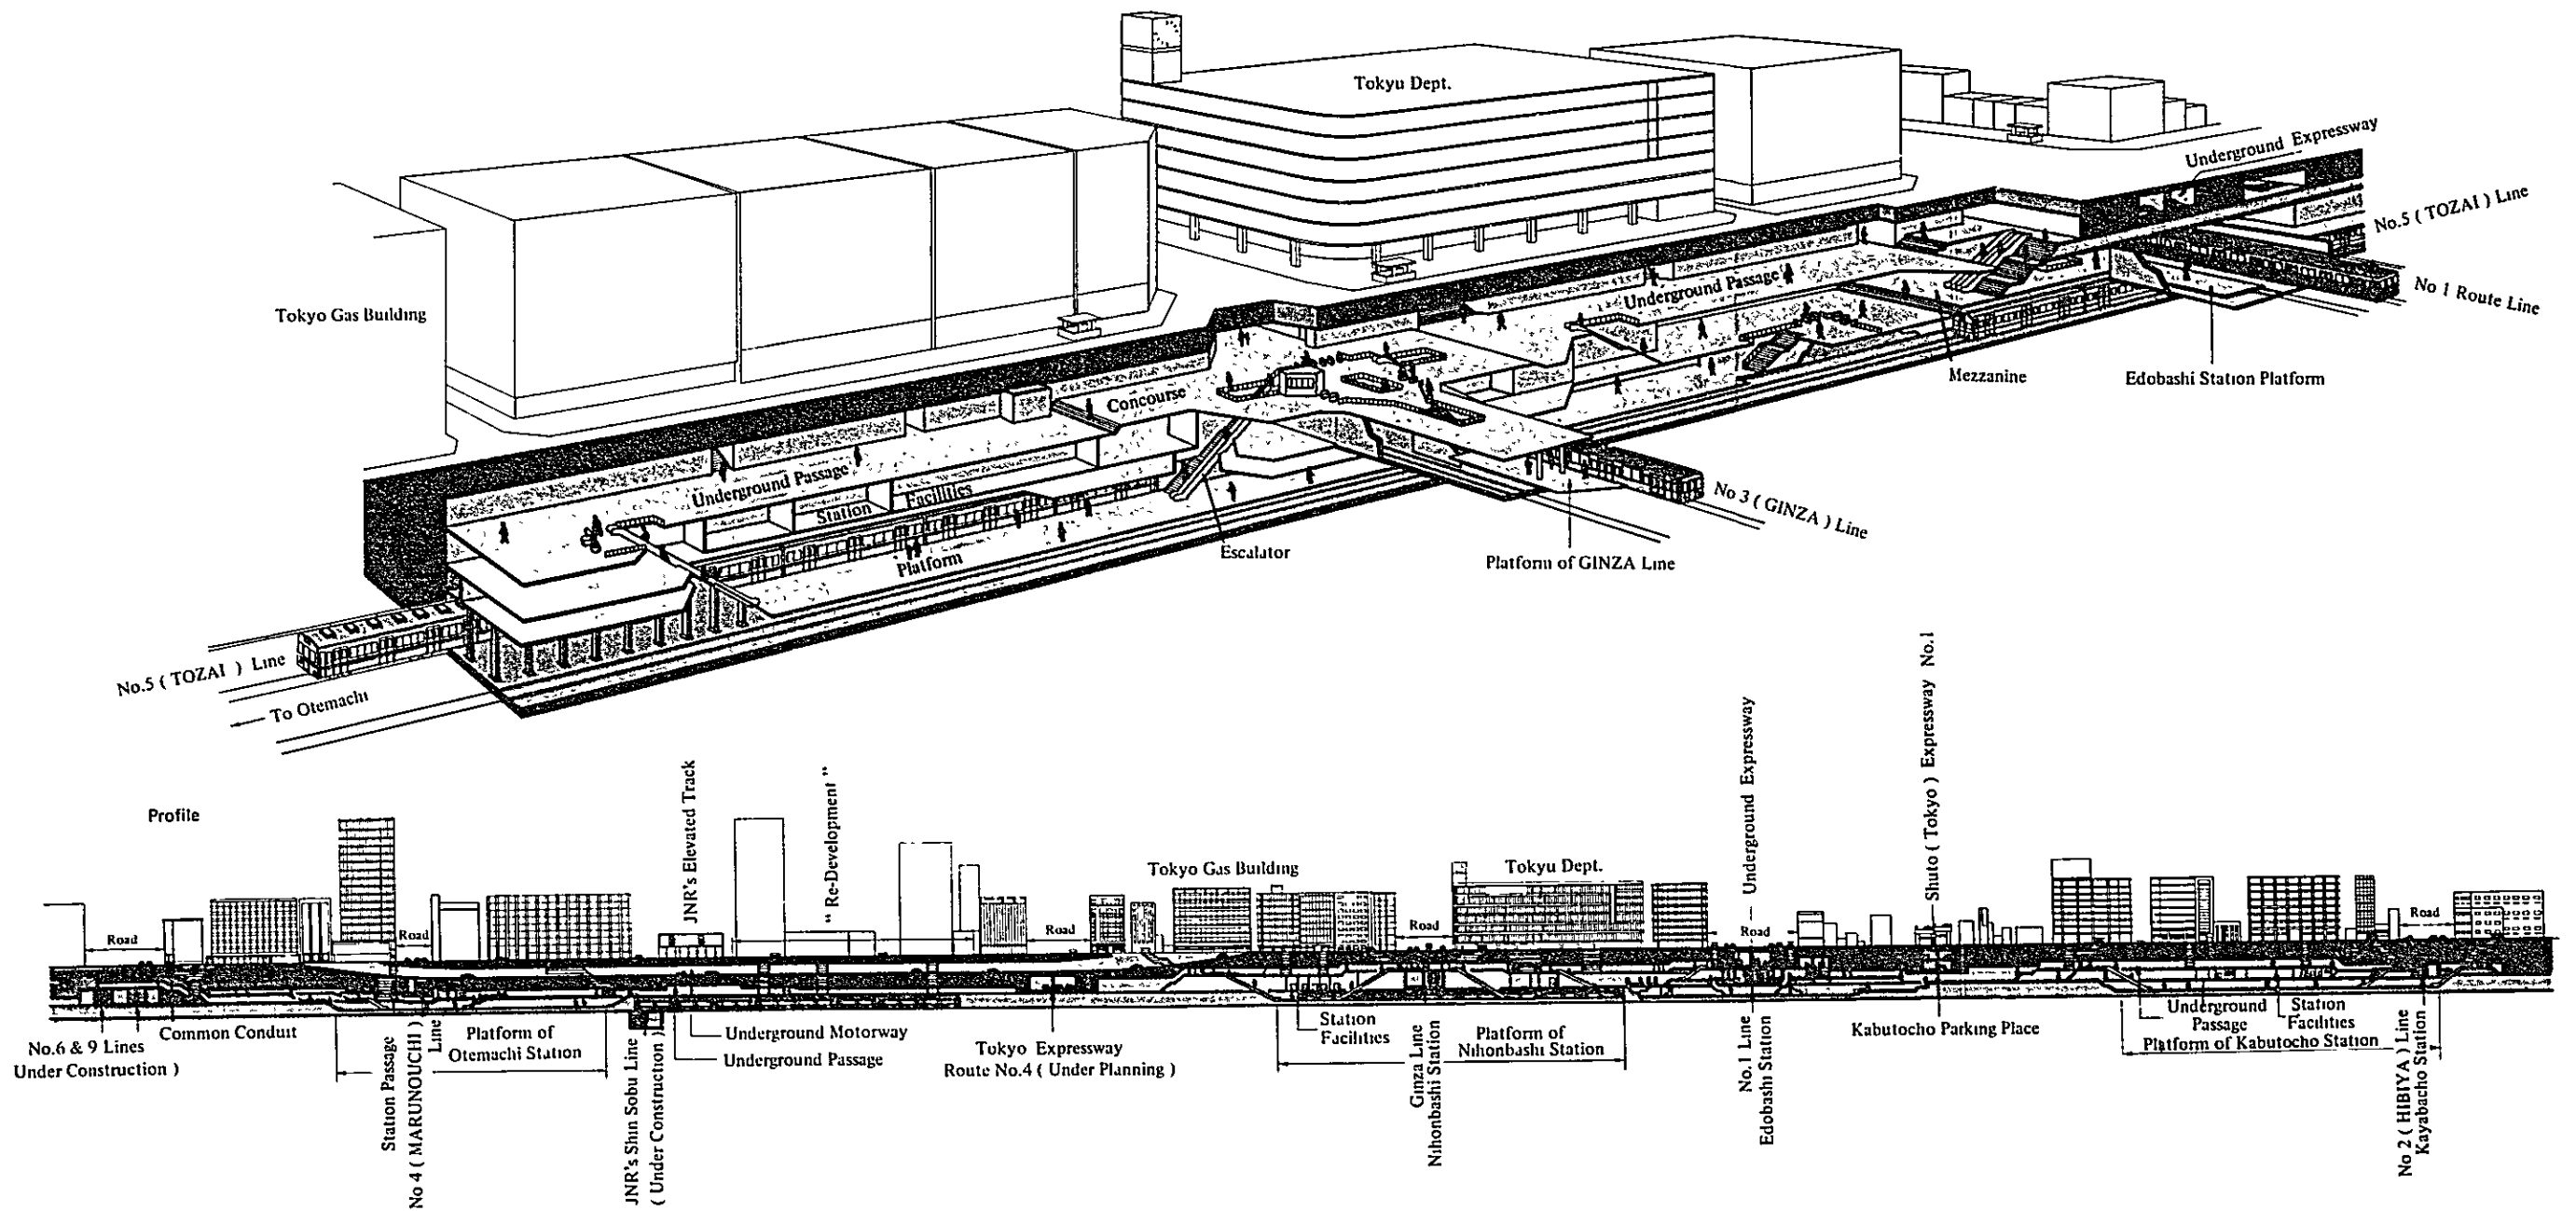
6 - 13 BIRD'S-EYE VIEW OF CROSS STATION
